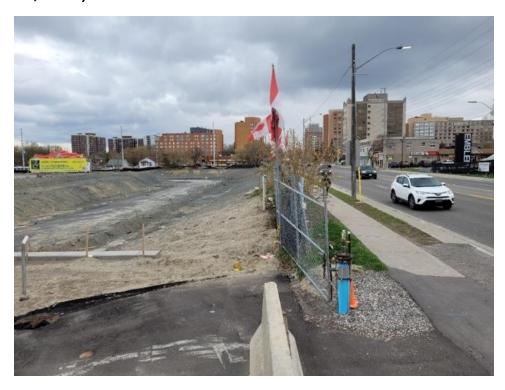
Typical streetscape at Dundas Street and Hurontario Street, facing west (April 1, 2021)
